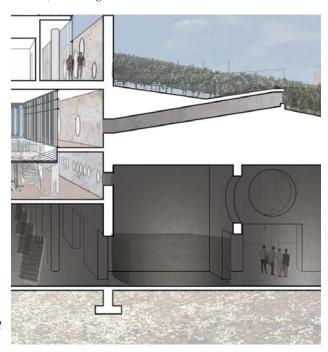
Detail view highlighting view portal from fermentation room through vineyard.
